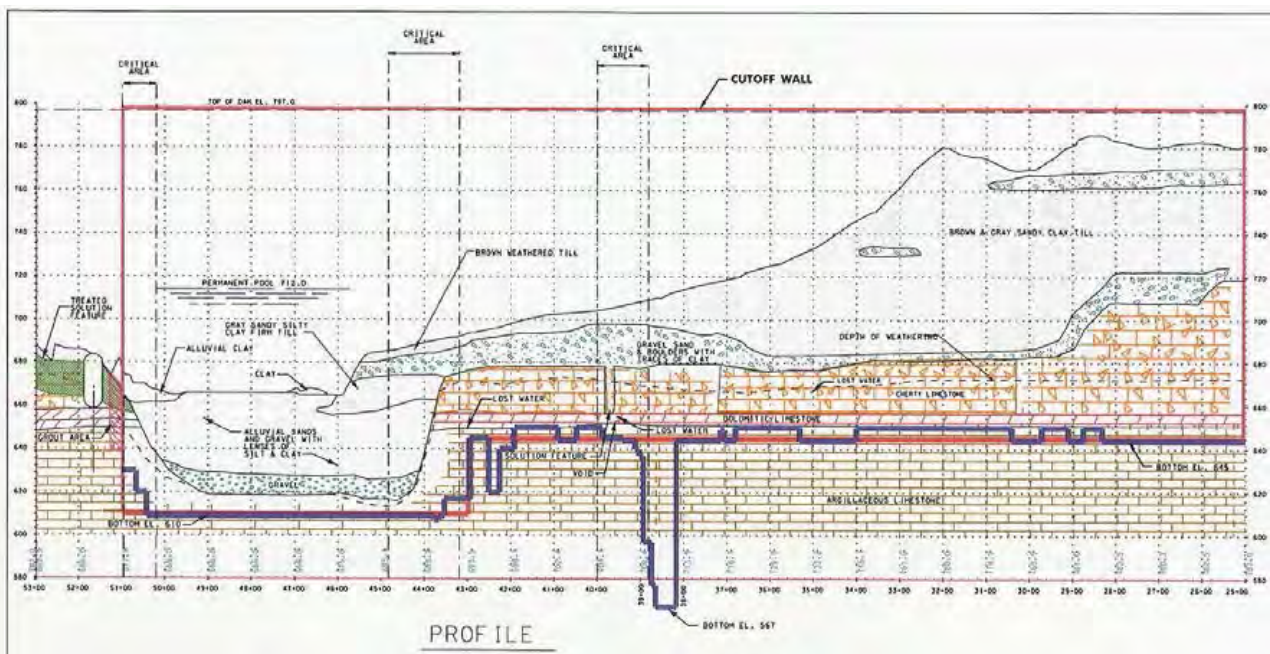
Final cutoff wall profile. The blue line shows the revised bottom depths of the cutoff wall as extended during construction. Vertical exaggeration is 5X.
